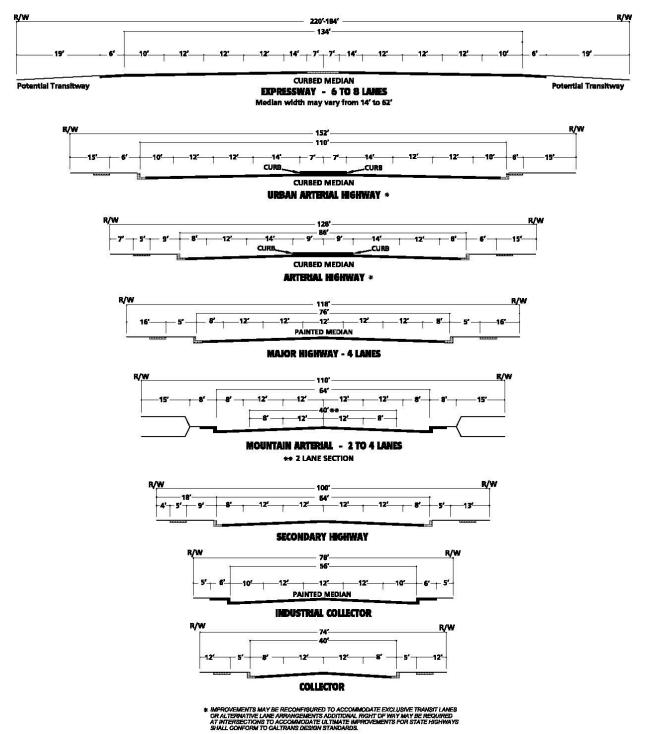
COUNTY OF RIVERSIDE GENERAL PLAN ROADWAY CROSS-SECTIONS
